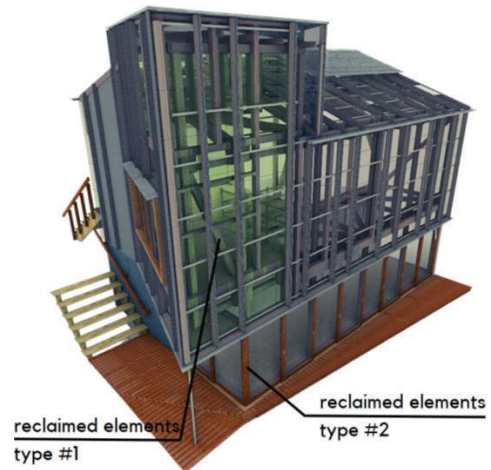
General view of the structure with the facade, type #1 elements come from Norway, type #2 come from Japan.
